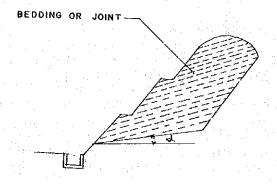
SCHEMATIC DIAGRAM OF FAILURE OF DIP SLOPE STRUCTURE WITH FISSURES
